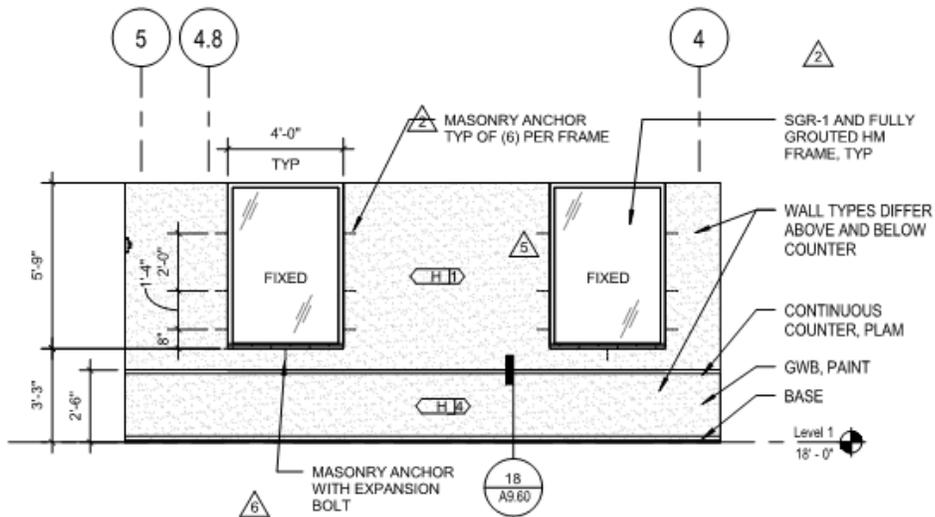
Detail 20 showing Section of the Traffic Service Counter
